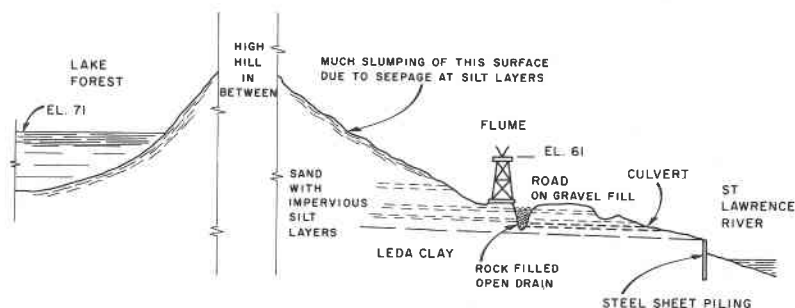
CROSS-SECTION THROUGH LOG FLUME AND ACCESS ROAD
